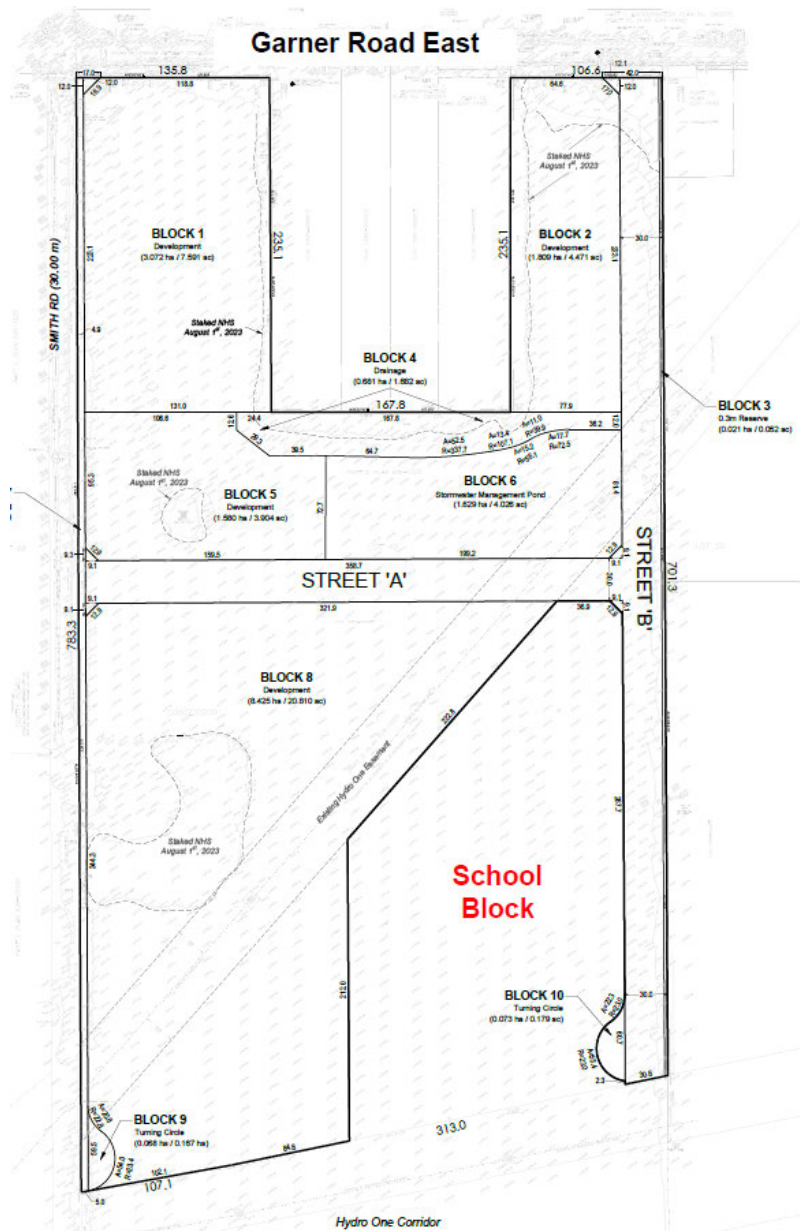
Approved Draft Plan of Subdivision for 700 Garner Road East
